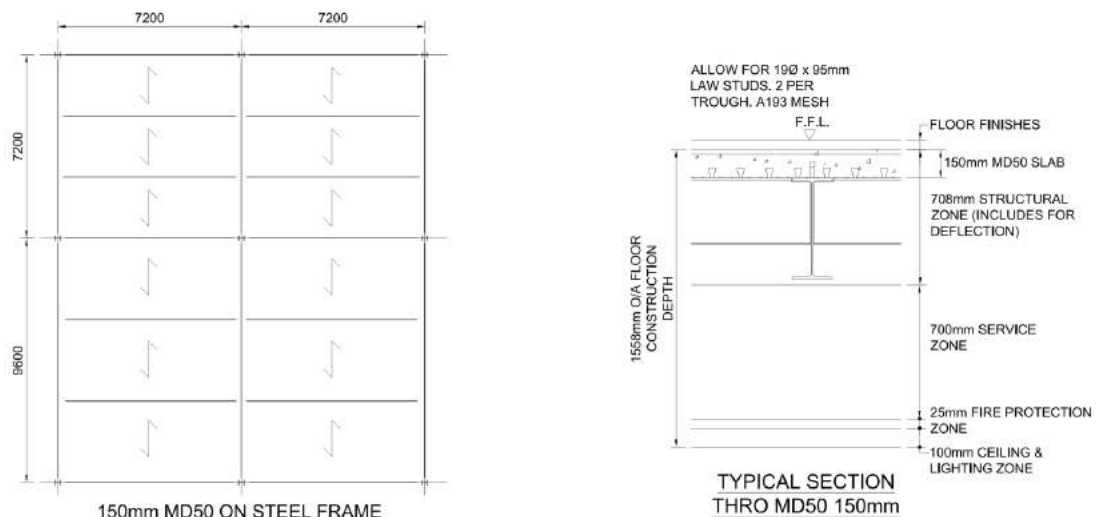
General arrangement and section for a steel frame and composite slab solution
